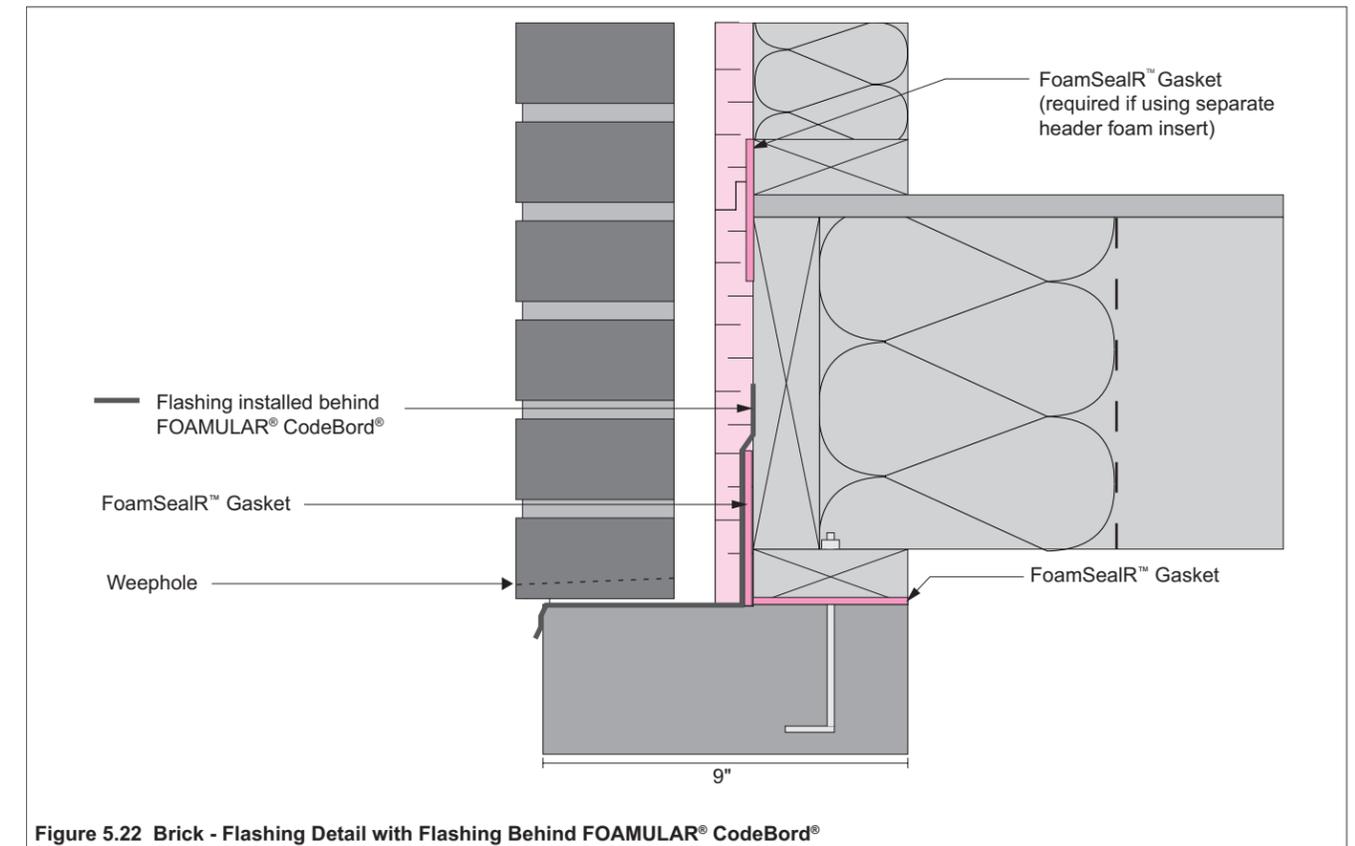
Brick - Flashing Detail with Flashing Behind FOAMULAR® CodeBord®
